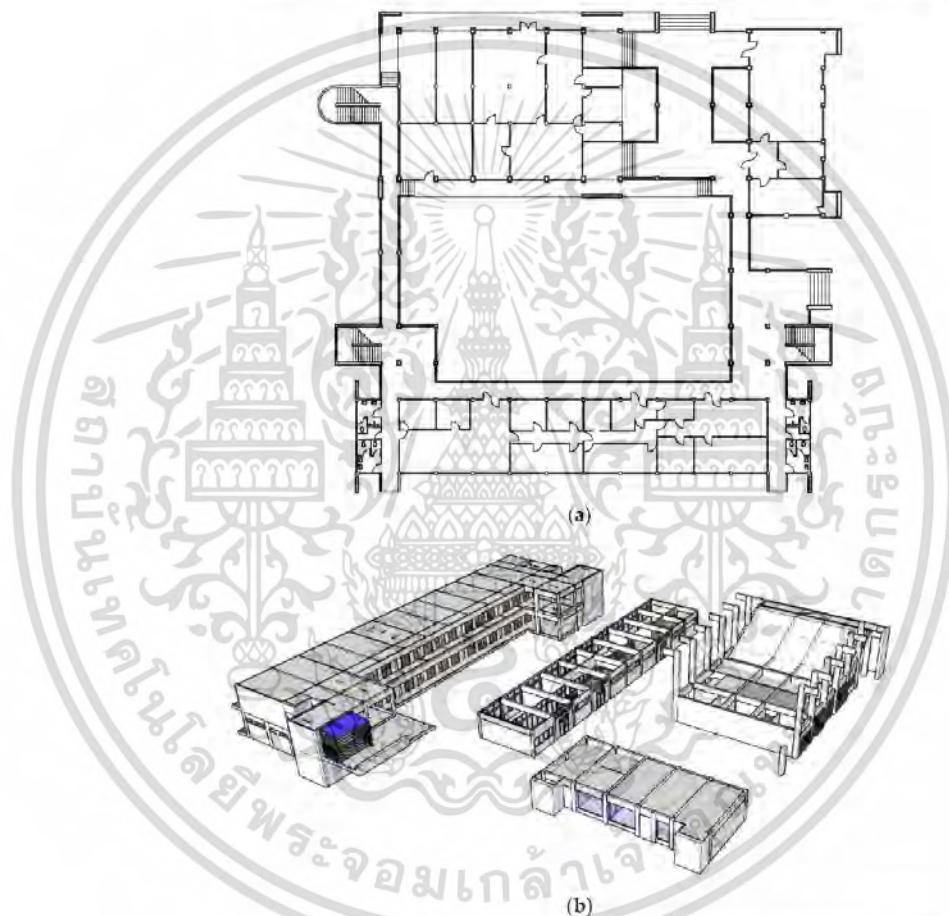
Building of the Department of Civil Engineering, School of Engineering, King Mongkut's Institute of Technology Ladkrabang, Thailand: (a) floor plan; (b) SketchUp diagram.
